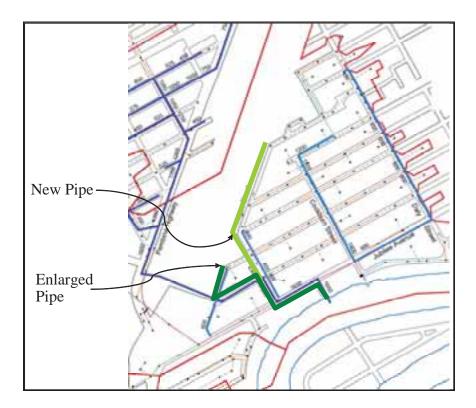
FRY Land Drainage Connection to Cockburn Hybrid (With the Elm Park Bridge Outfall Option)
